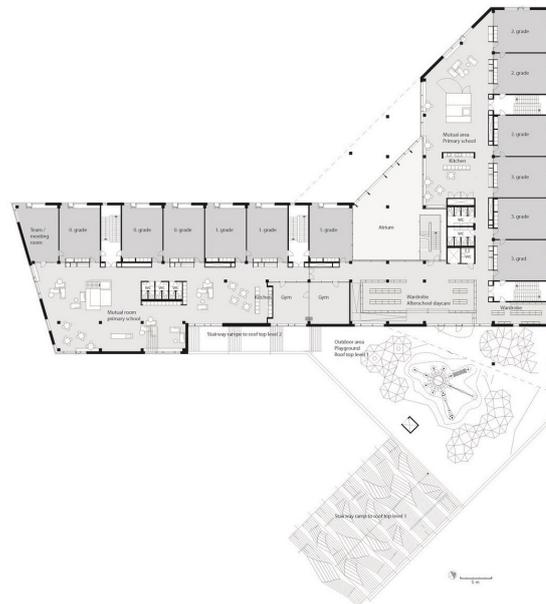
Sydhavnen School, 2nd floor plan.⁷
